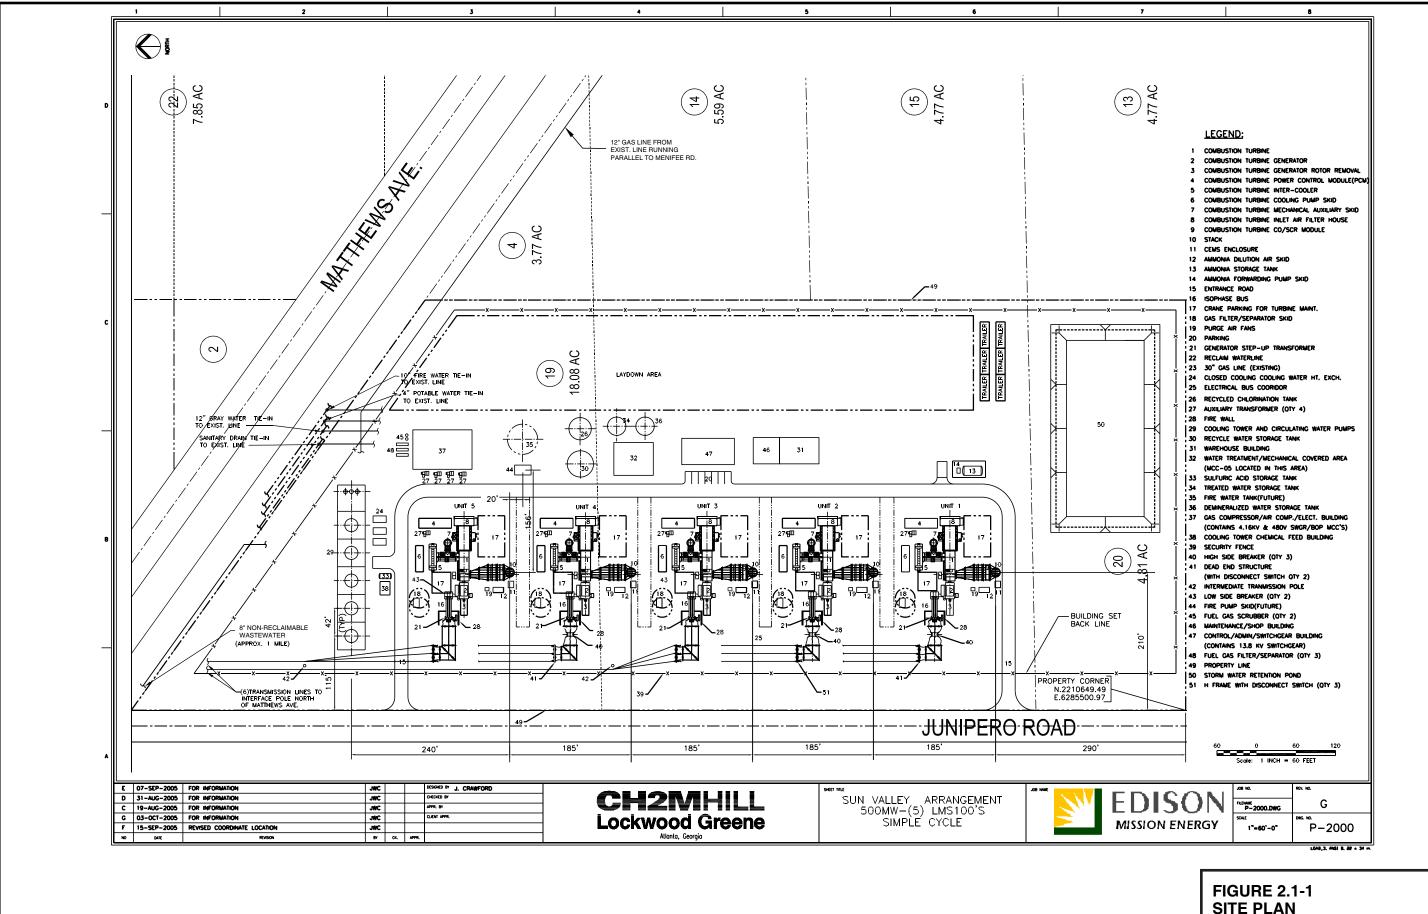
shows the general arrangement and layout of the facility, and Figures 2.1-2a and 2.1-2b are typical elevation views. Primary access to the site will be provided from the south via Rouse (Russell) Road. Access during operation will be via Rouse Road and Junipero Road, from the south. The project site is located in an area that is designated for industrial land use, zoned manufacturing-service commercial, and that is currently in agricultural use. It is surrounded to the south, east, and west, by industrial and agricultural uses. To the north are the Burlington Northern and Santa Fe (BNSF) railroad and SCE Valley Substation. To the northwest are areas zoned industrial that are in agricultural use or industrial use, including the Inland Empire Energy Center, which is under construction. To the east is an open agricultural field planned for Light Industrial uses and, east of Menifee Road, the Menifee Valley Ranch residential development, which has recently begun construction. To the south are agricultural and residential uses.
